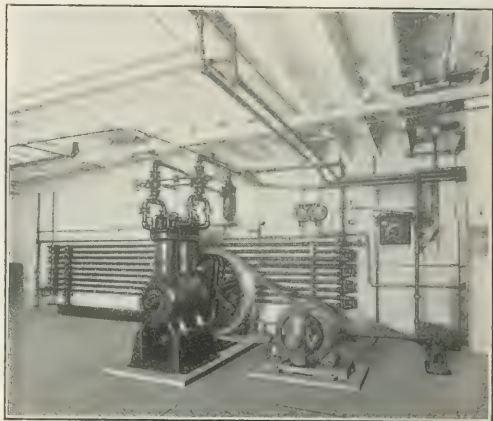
REFRIGERATING PLANT IN BASEMENT
